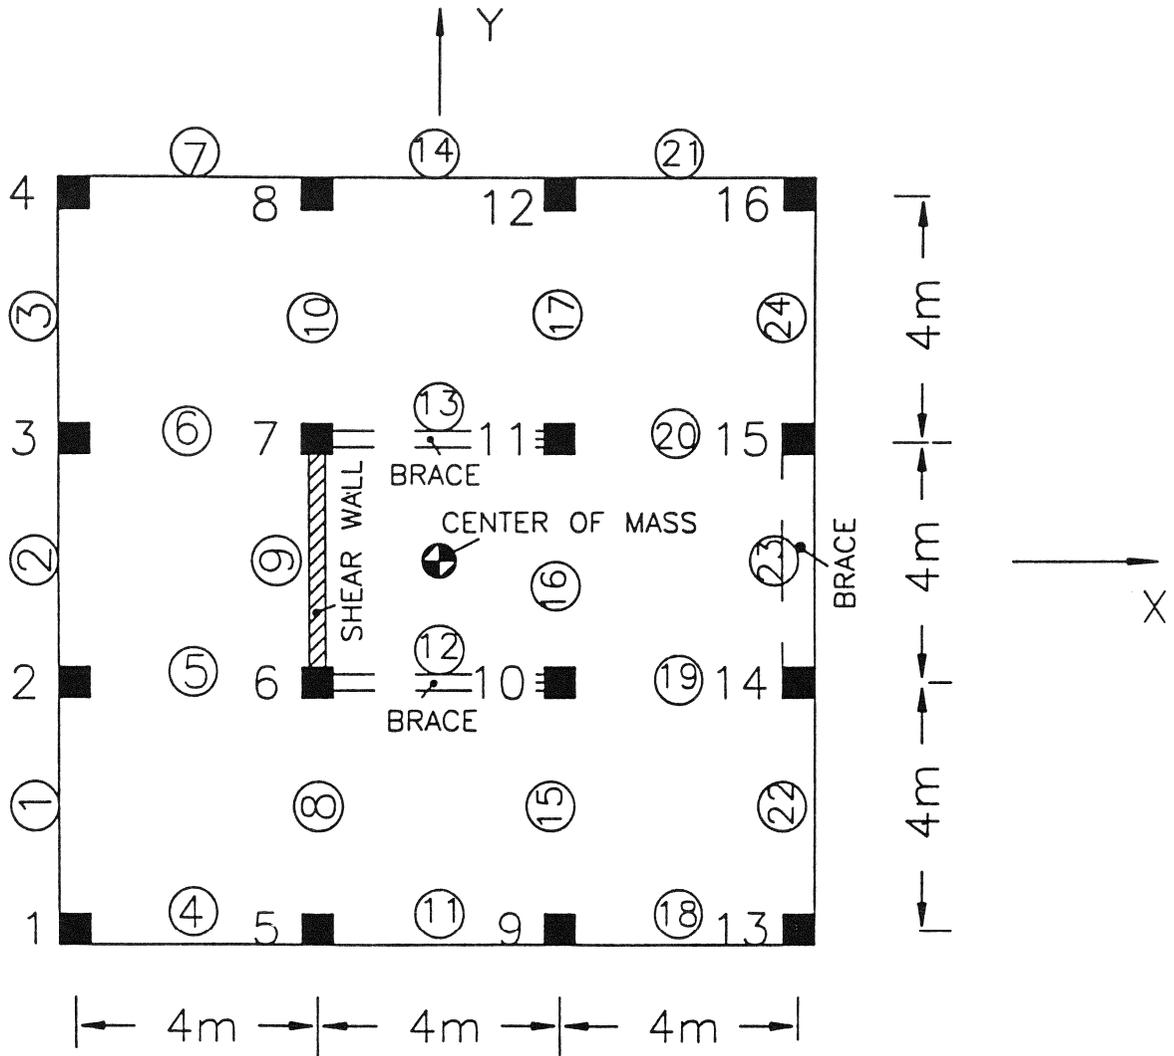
Plan of the Sliding Isolation System with Teflon - Steel Disc Sliding Bearings and Recentering Springs
